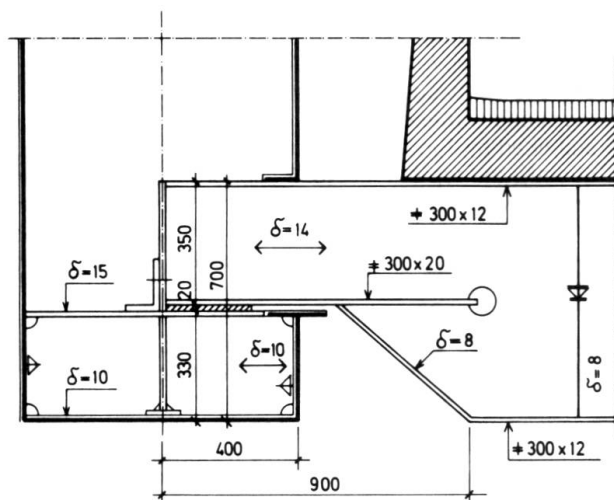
Unequal deflections on lateral girders ends by which reinforced concrete deck slabs were supported
